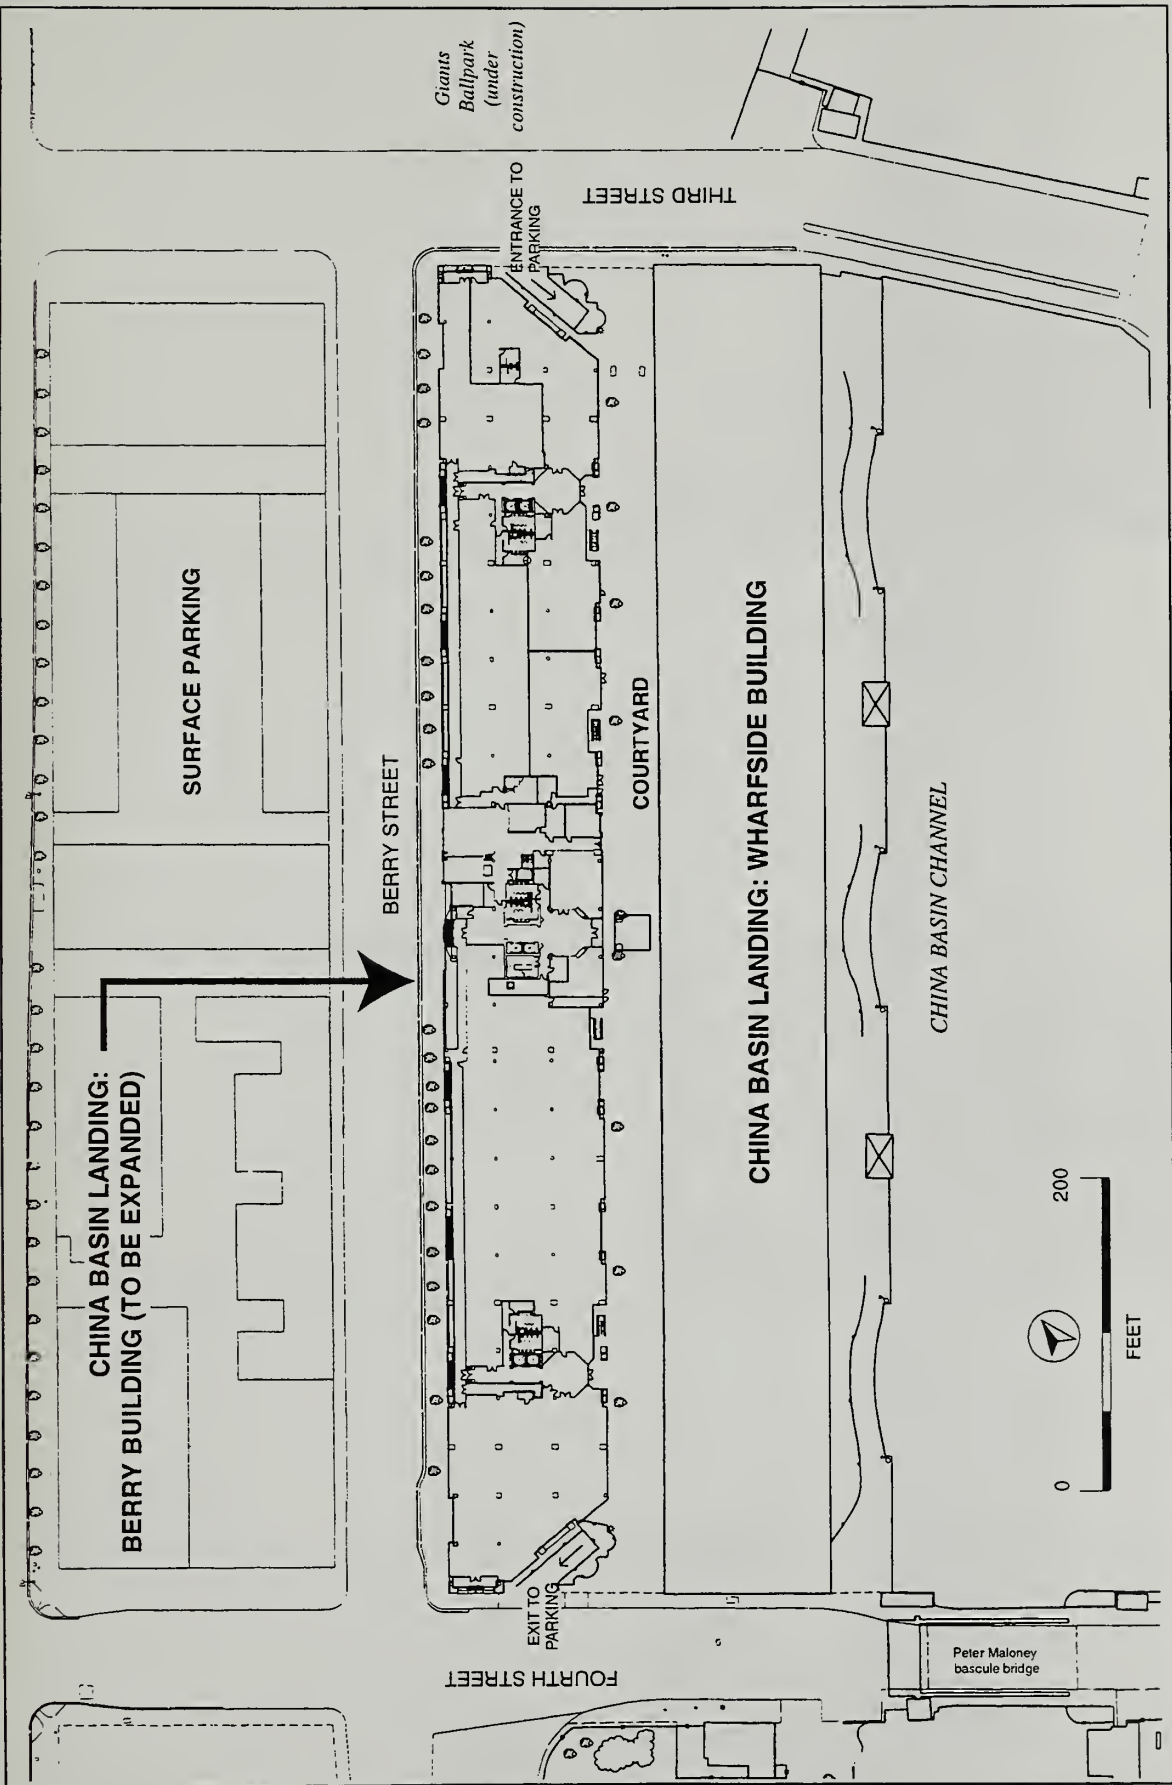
shows a plan view of the project site and the surrounding area, including the location of Pacific Bell Ballpark for the San Francisco Giants, currently under construction across Third Street. Figures 3 and 4 show two elevations of the proposed Berry Building, including the existing three stories, plus the three stories to be added.
